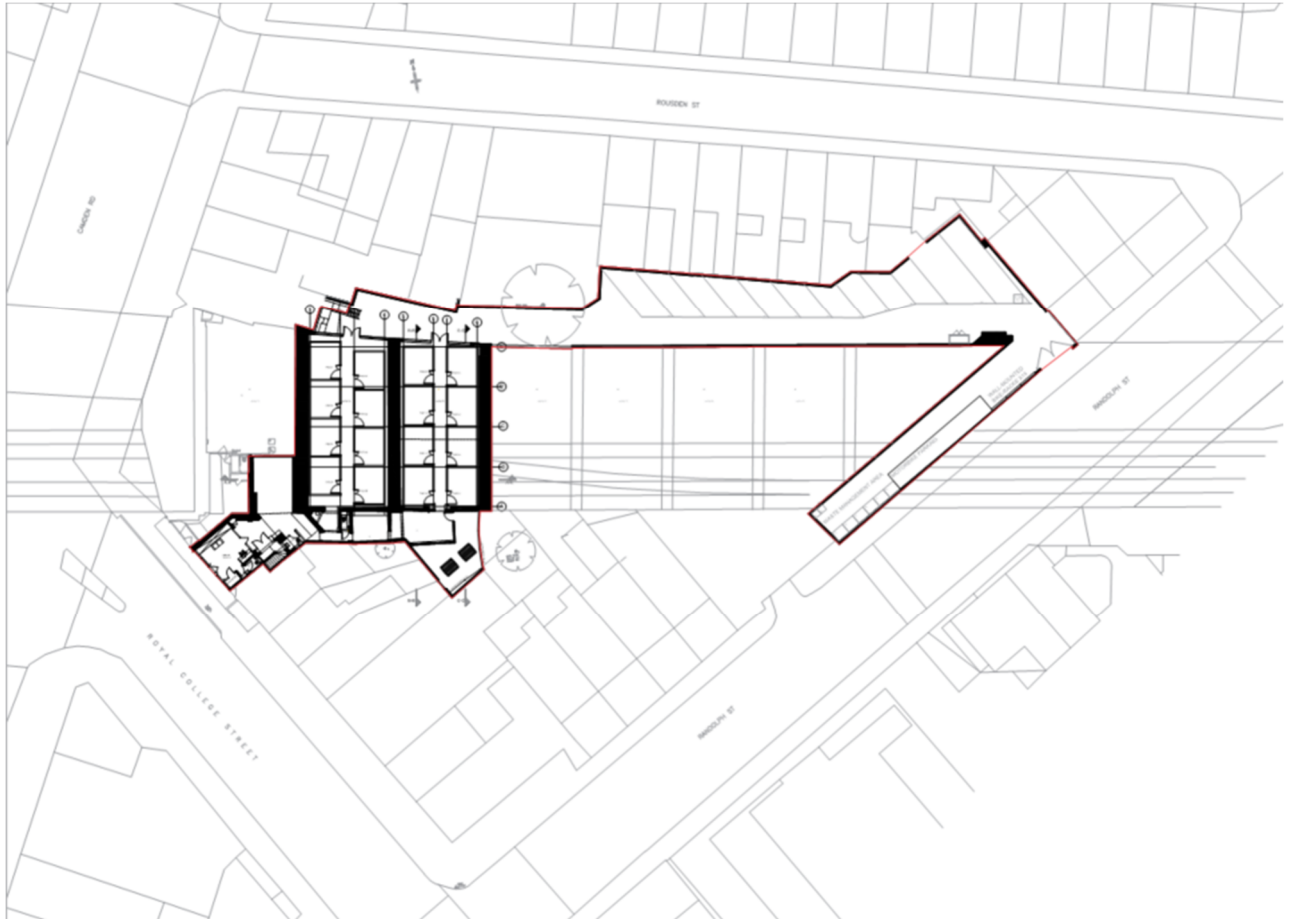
Proposed Block Plan showing 16 Kitchen Pods (application 2021/4163/P, submitted by the applicant/ appellant).
